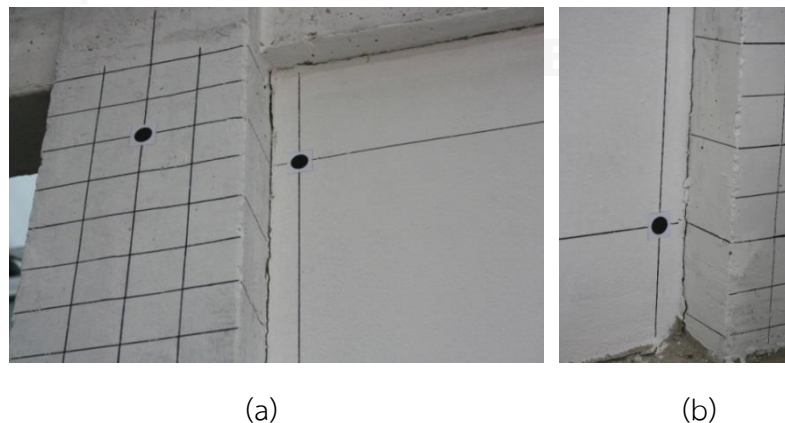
The separations between surrounding RC frame and URM infill panel of specimen MIRCF01 at 0.125% drift; (a) top corner and (b) bottom corner
